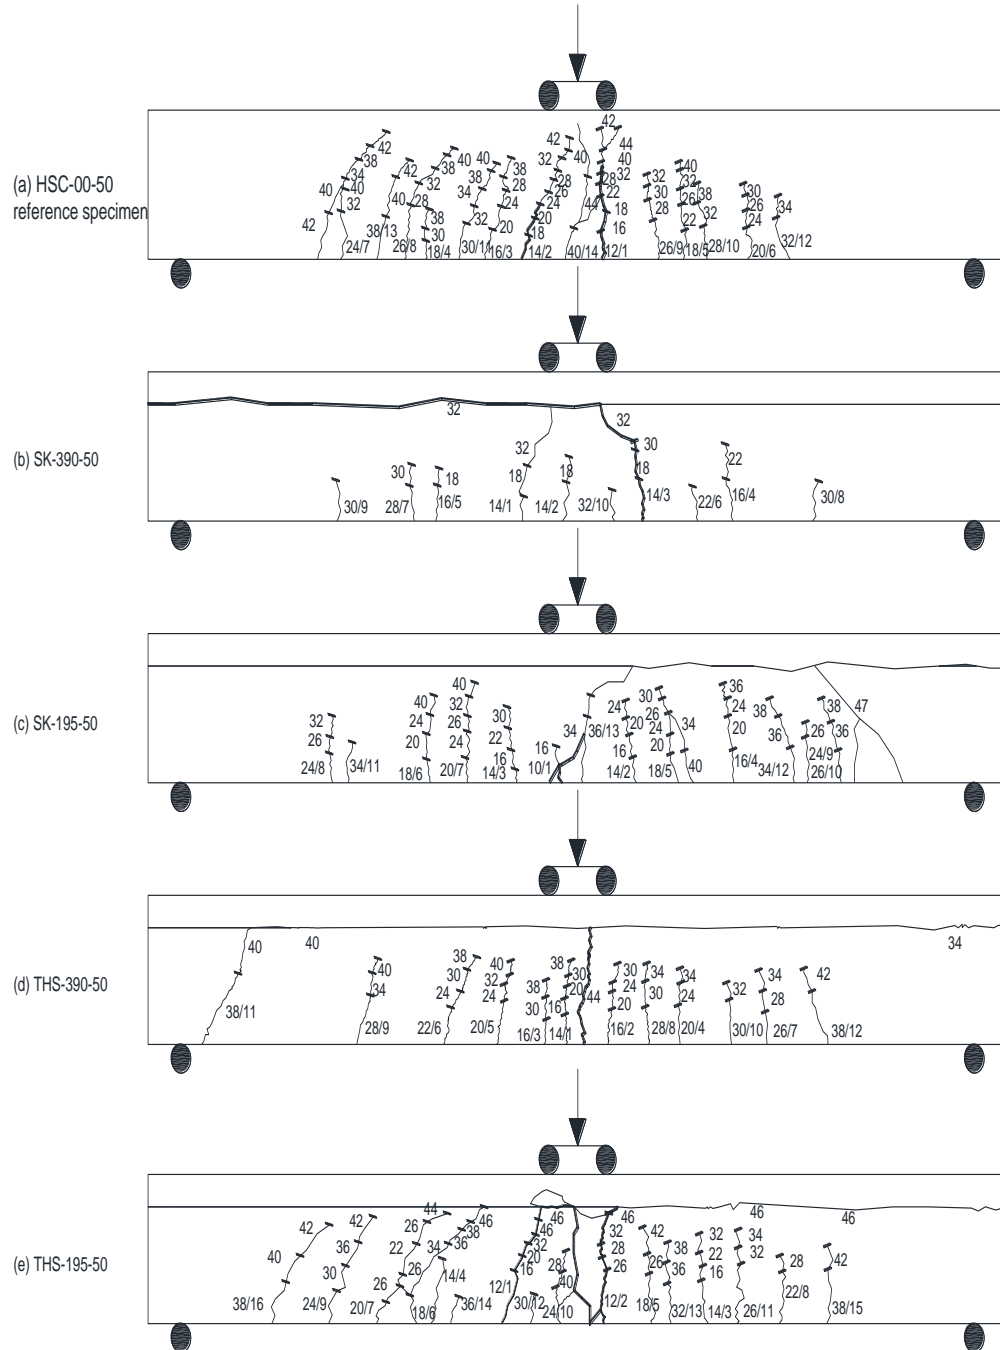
Crack patterns at failure for the specimens with a 50 mm top layer.
